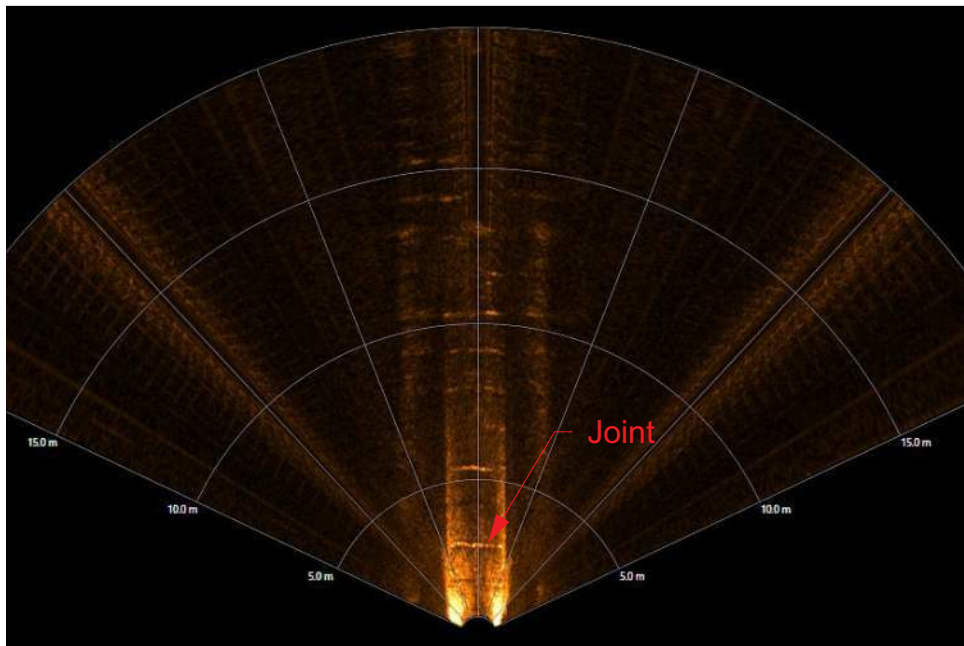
Sonar image at 584 feet downstream of Access Point 1. Joint spacing visible.
